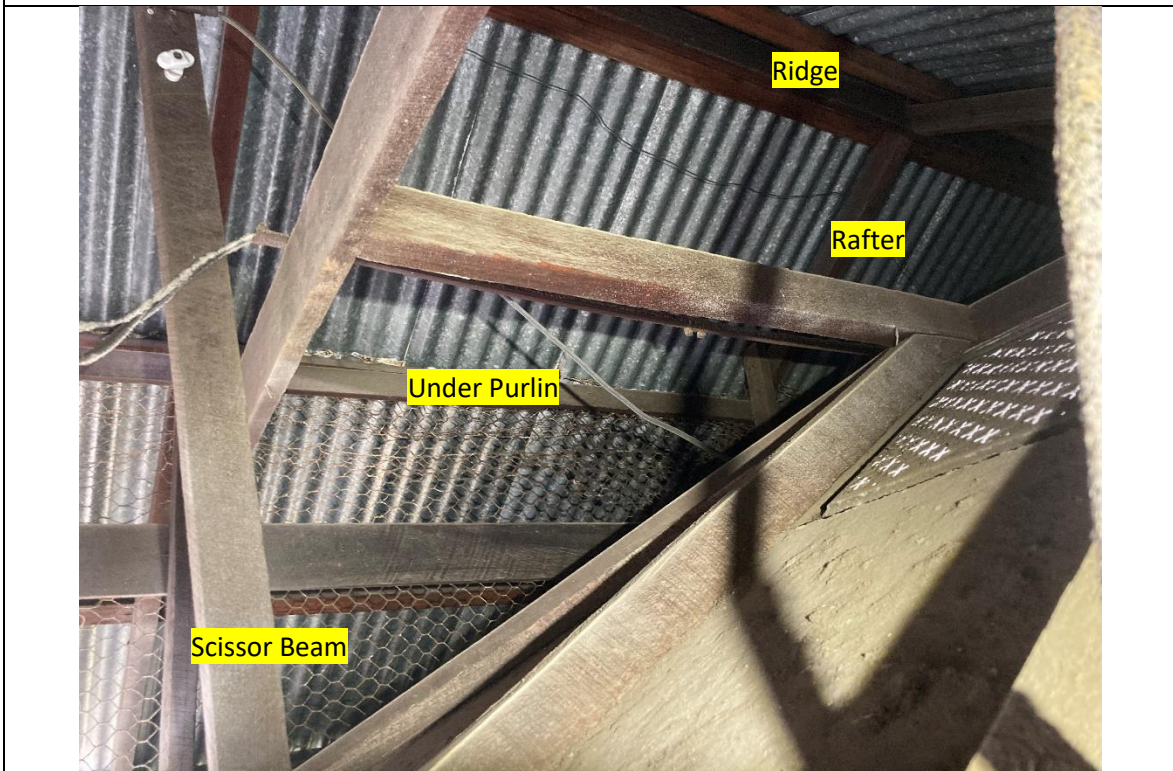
Overall view of the timber ridge beam, purlins and rafters.
